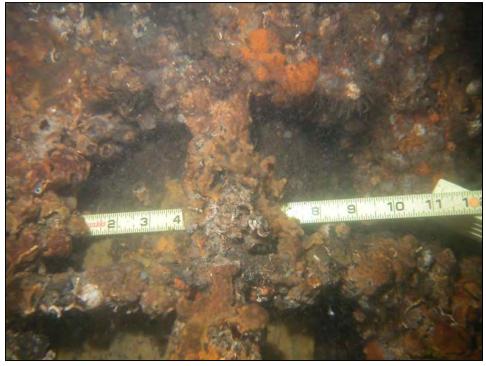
Underwater photo of exposed reinforcement. (Photo by Childs Engineering Corp.)
